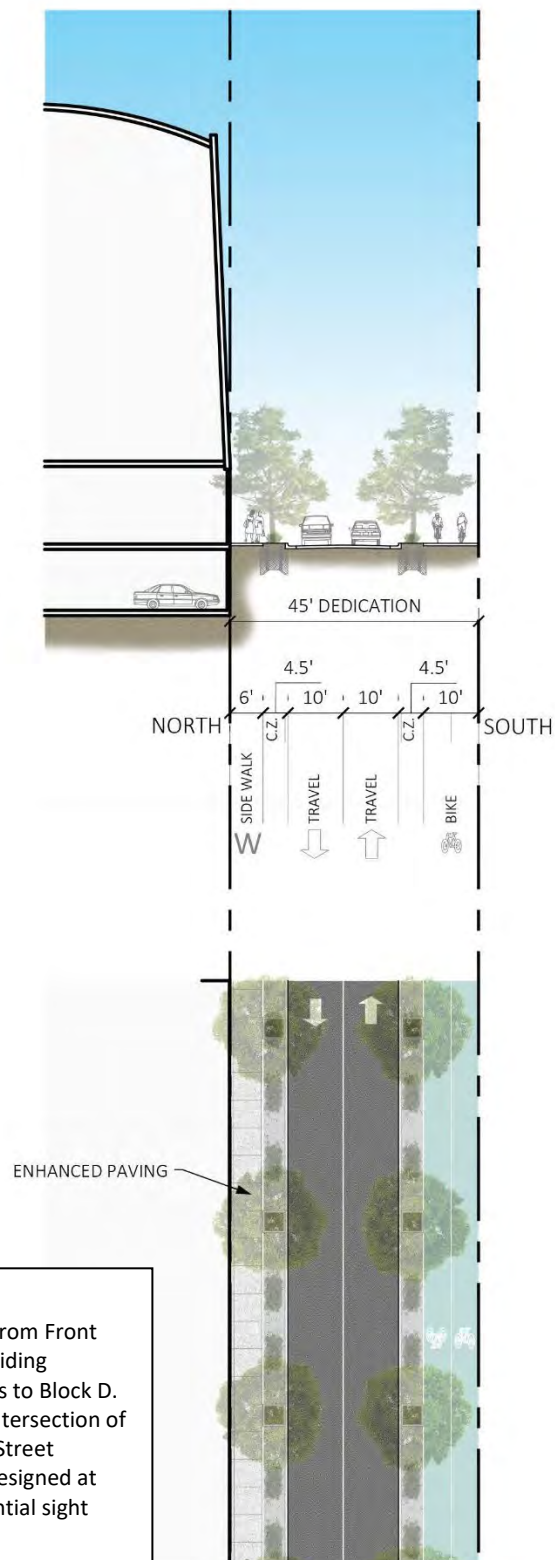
Cliff Street Between Third Street and Trinity Street (11)
